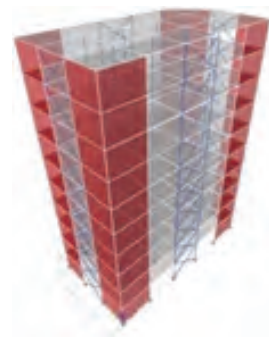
Building with shear wall, bracings and CFST columns (outer frame top 1-6 stories)
